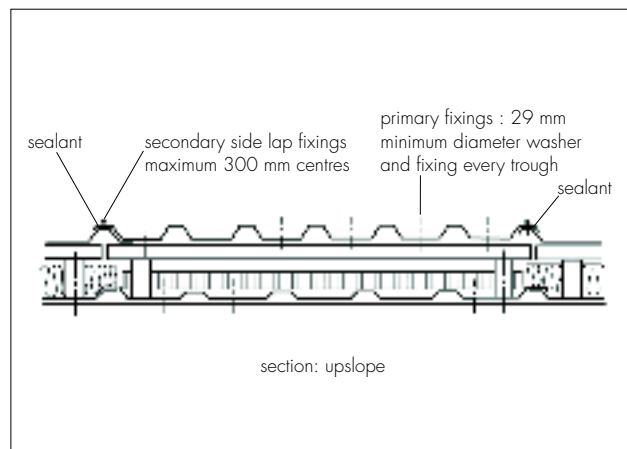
Fixing detail for site-assembled rooflights — side laps, overlap/overlap
